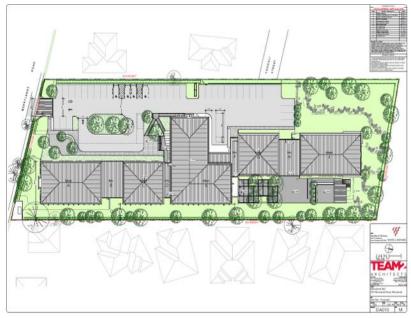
Site Plan showing the proposed development at the subject site and relationship with adjoining properties
